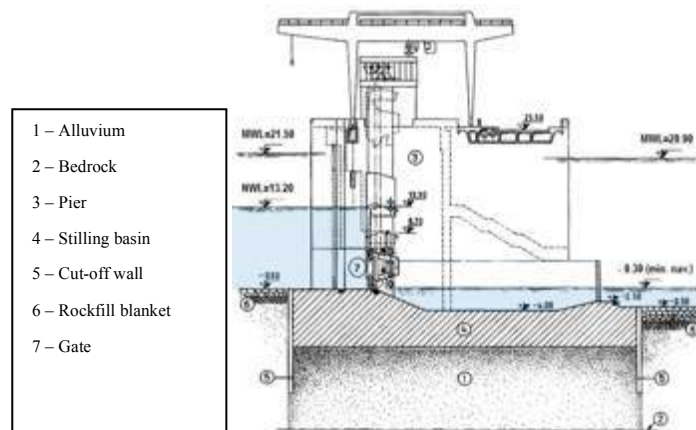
Crestuma-Lever cross section (Álvares Ribeiro *et al.*, 1982).
